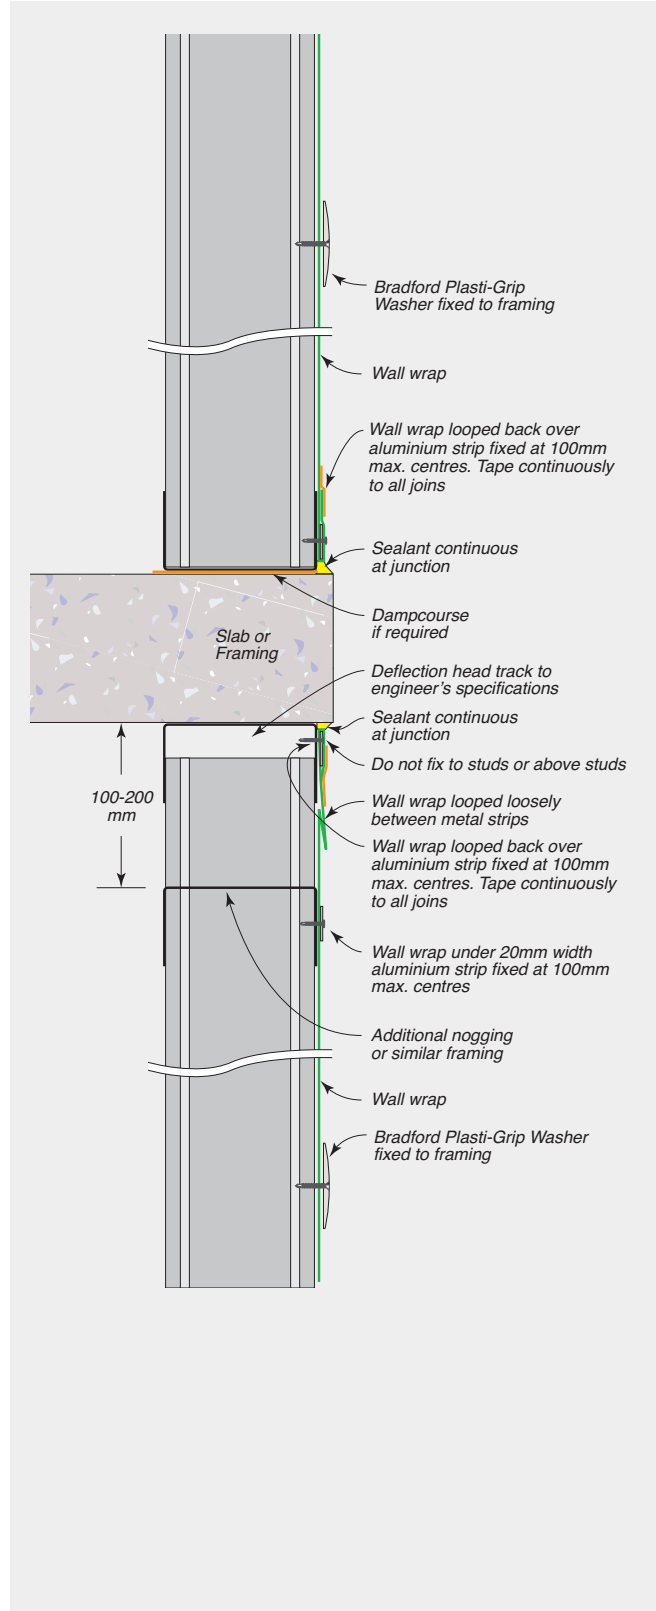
Wall Wrap Installation at Intermediate Level Junction – Non-loadbearing Steel Framing With Deflection Head
